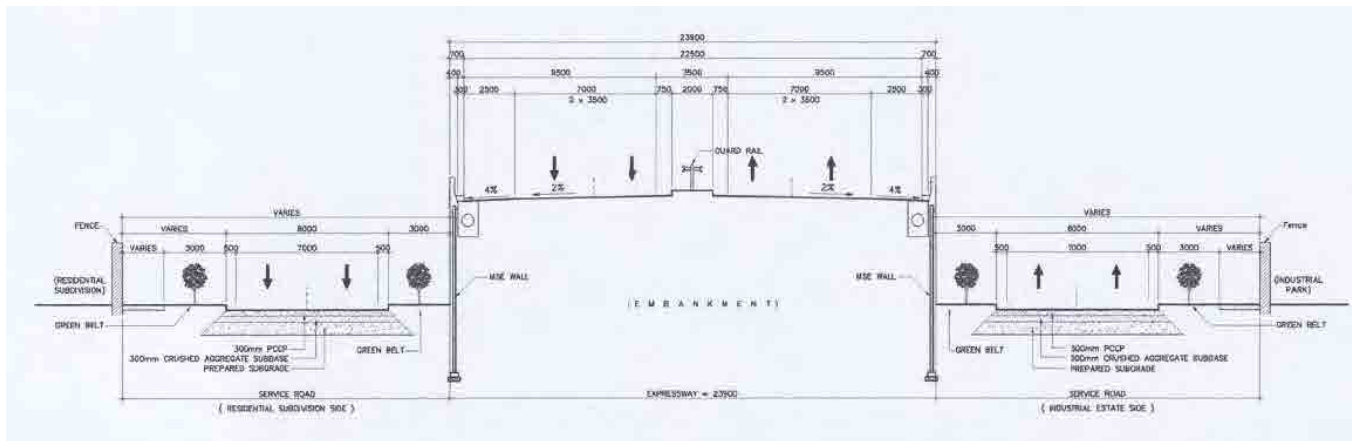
(2) TYPICAL CROSS SECTION (MSE WALL SECTION)
